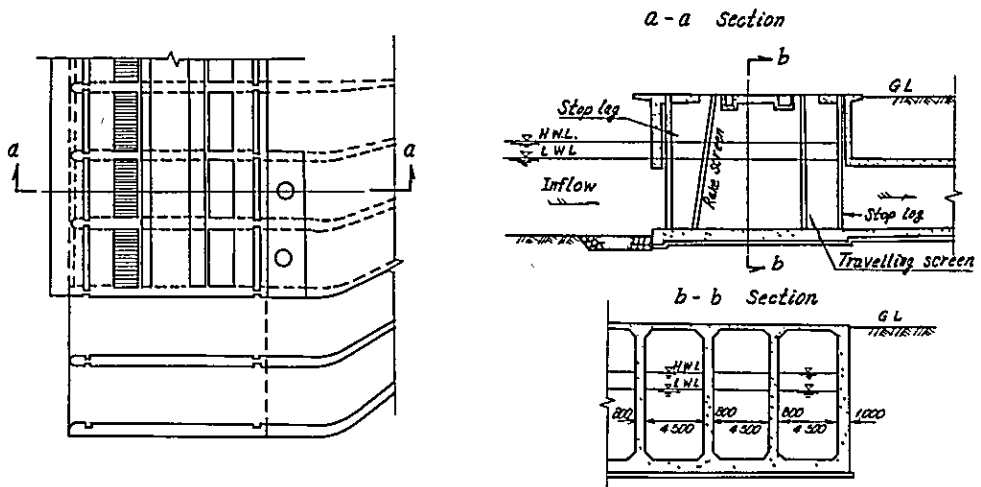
·3·19 Structural Type of Screen House (No. 2)
